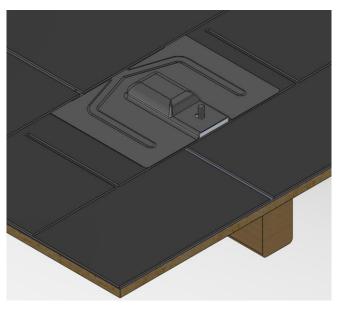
Installed Flashing (Truss Mounting Shown) Kinetic Solar K-Rack™ Installation guide
